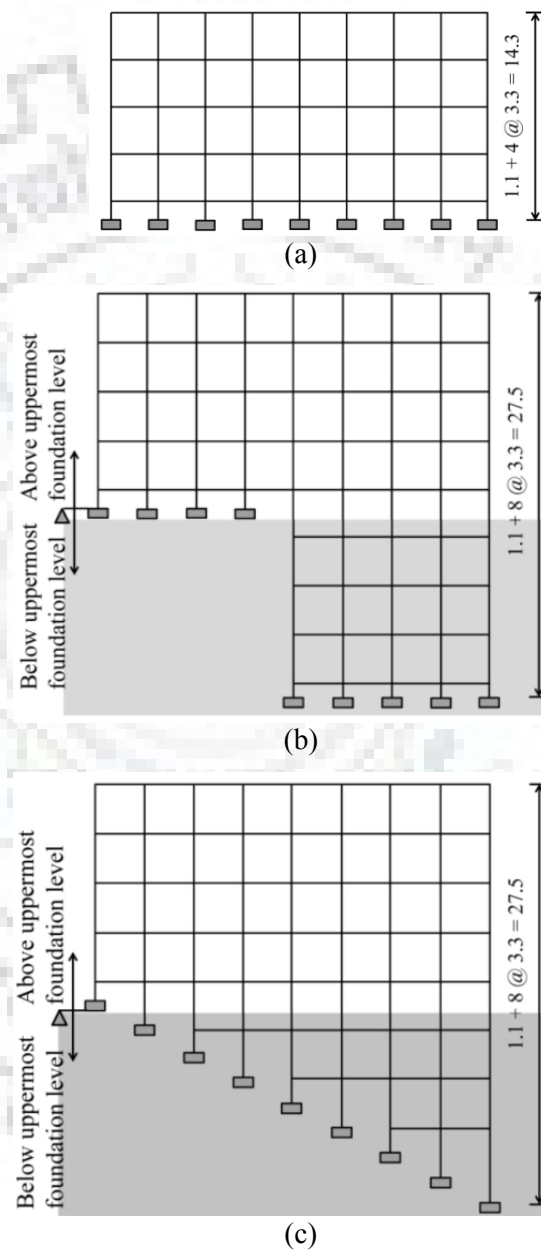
Typical layouts of the investigated structural configurations: (a) elevation of a 4-storey building (SC A); (b) elevation of a 4-storey split-foundation (SF) building (SC B); and (c) elevation of a 4-storey step-back (SB) building (SC C). The gray-shaded area shows the building's portion below the uppermost foundation level. In case of SF buildings, the short-columns are of 1.1 m height, whereas in case of SB buildings, the short-columns are of 1.1 m and 2.75 m heights in successive storeys resting on the slope (refer to Fig. 4.1b and 4.1c).
